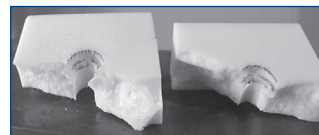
Subsequent destruction of sample shown in Fig. 12 with visible imprint of screw head
